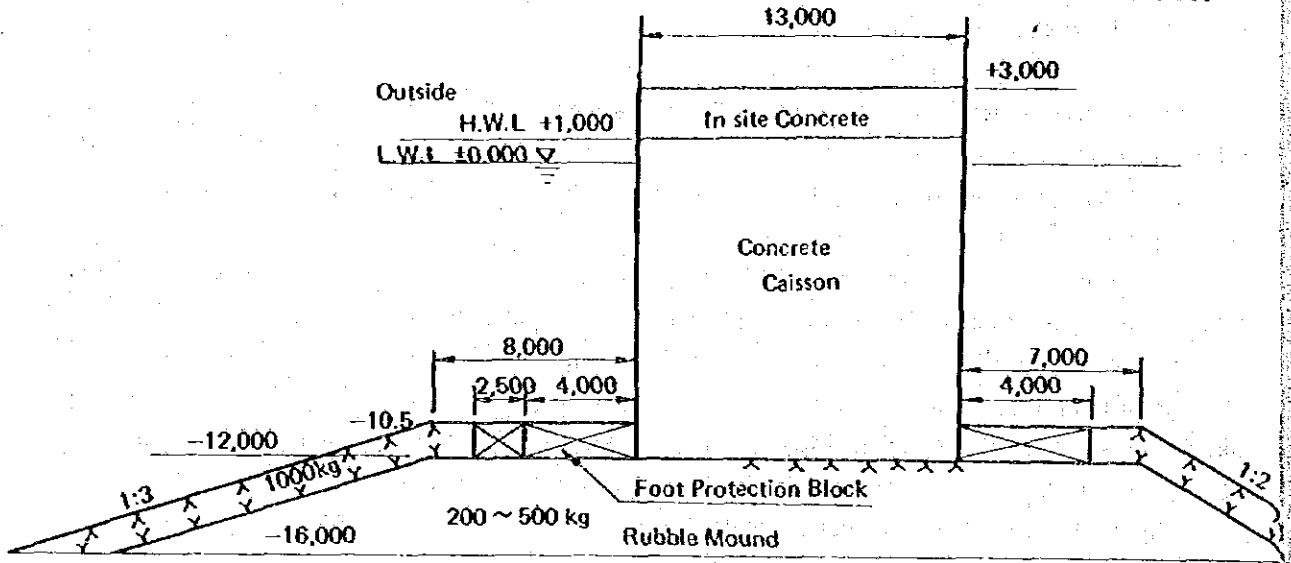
Crosssection of Rubble Mound Breakwater at -6m Depth
